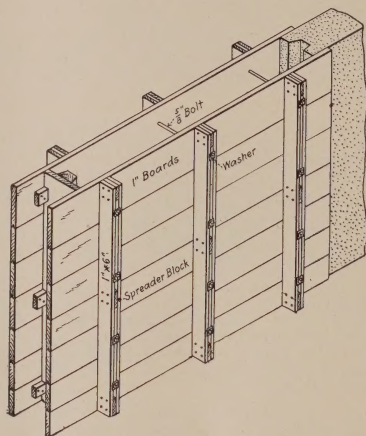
Form for foundation wall to be constructed in solid earth which will stand firmly in a vertical position. No outside form is used the earth acting as a form.
